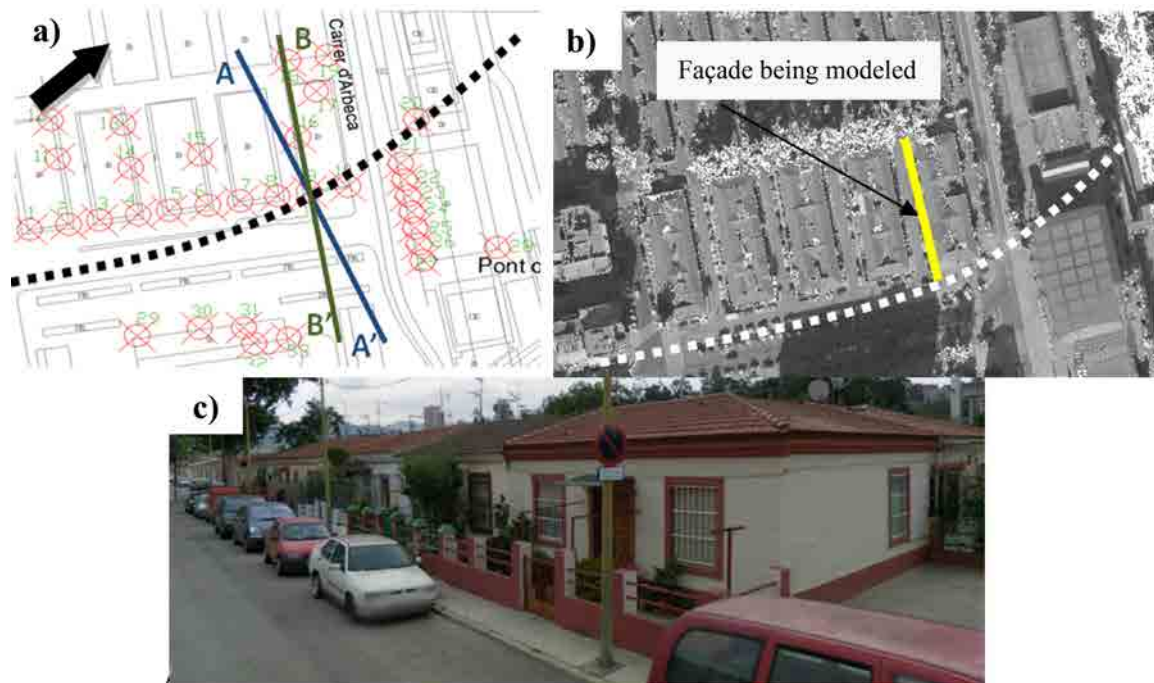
(a) Illustration of monitoring points, tunnel track and studied sections in Bon Pastor (BCN); (b) Aerial view of façade being modeled (Source: © Google Earth); (c) Street view of the dwellings (Source: © Google Earth).
